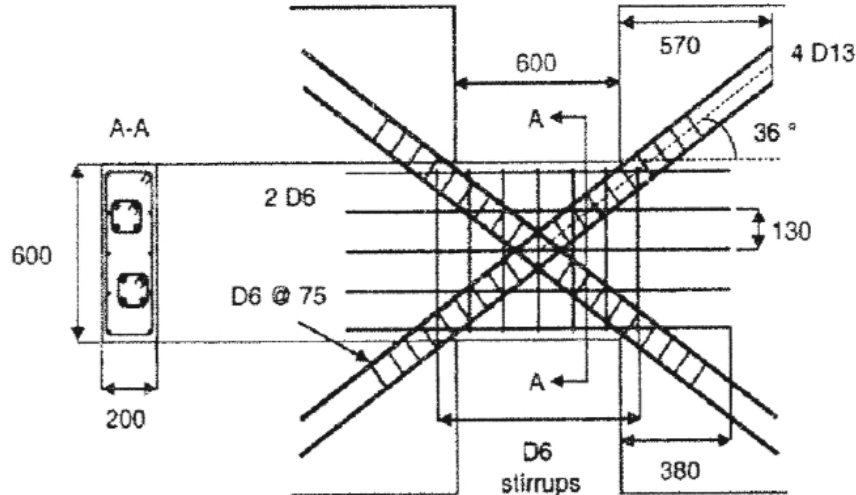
Canbolat et al. (adopted from Canbolat et al. 2005) Reinforcement Details for Coupling Beam
